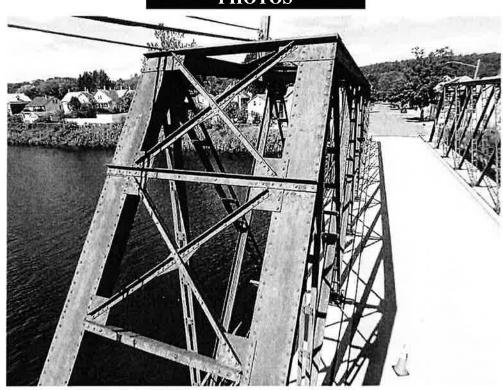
South truss at east portal – end posts and bracing with peeling paint and light rust.
